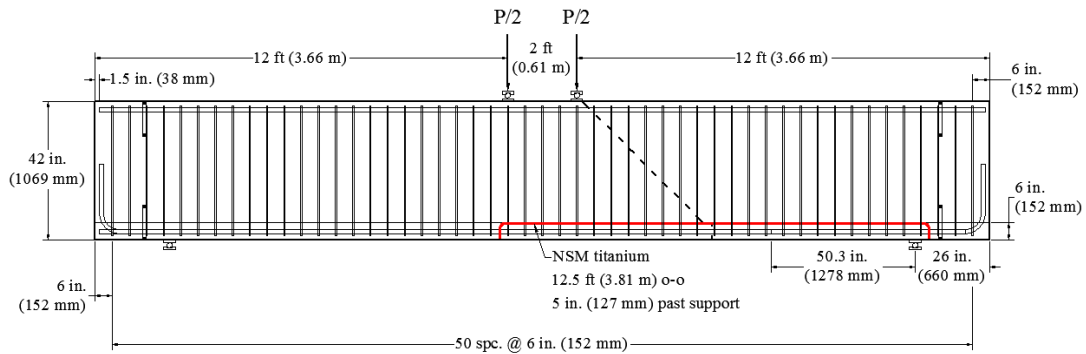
Elevation of specimen IT.45.Ld3(6).Ti
